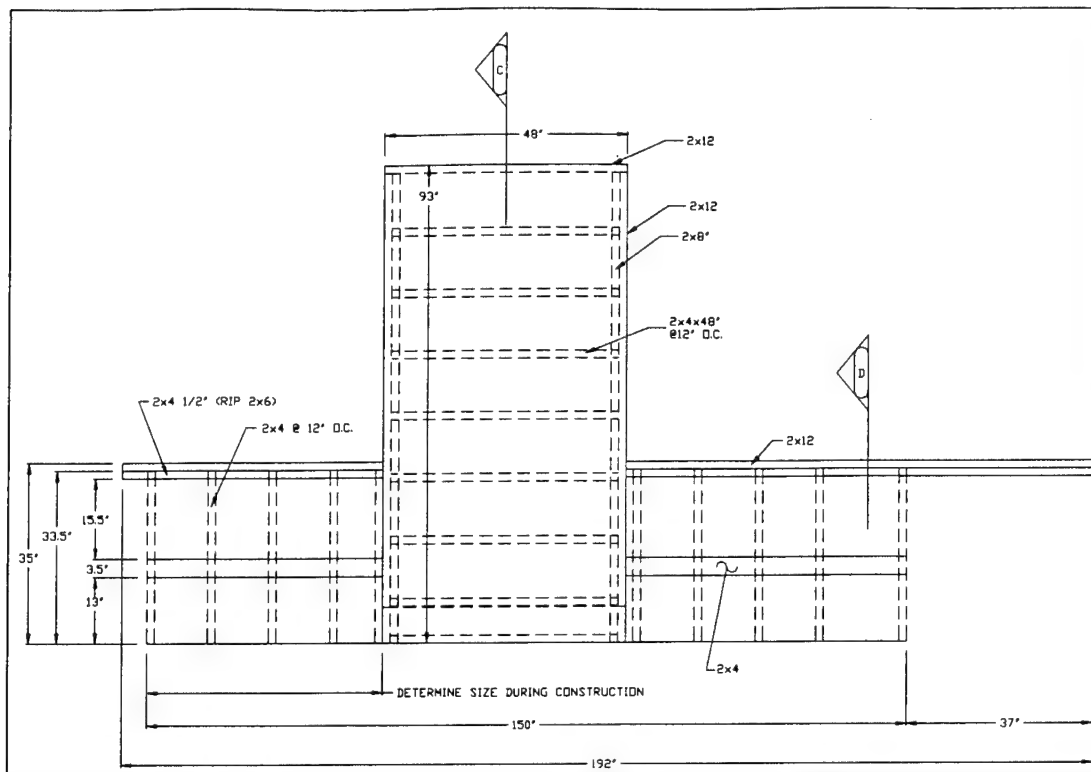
Plan view of the east portion of the TESS protection frame (west is mirror image).
